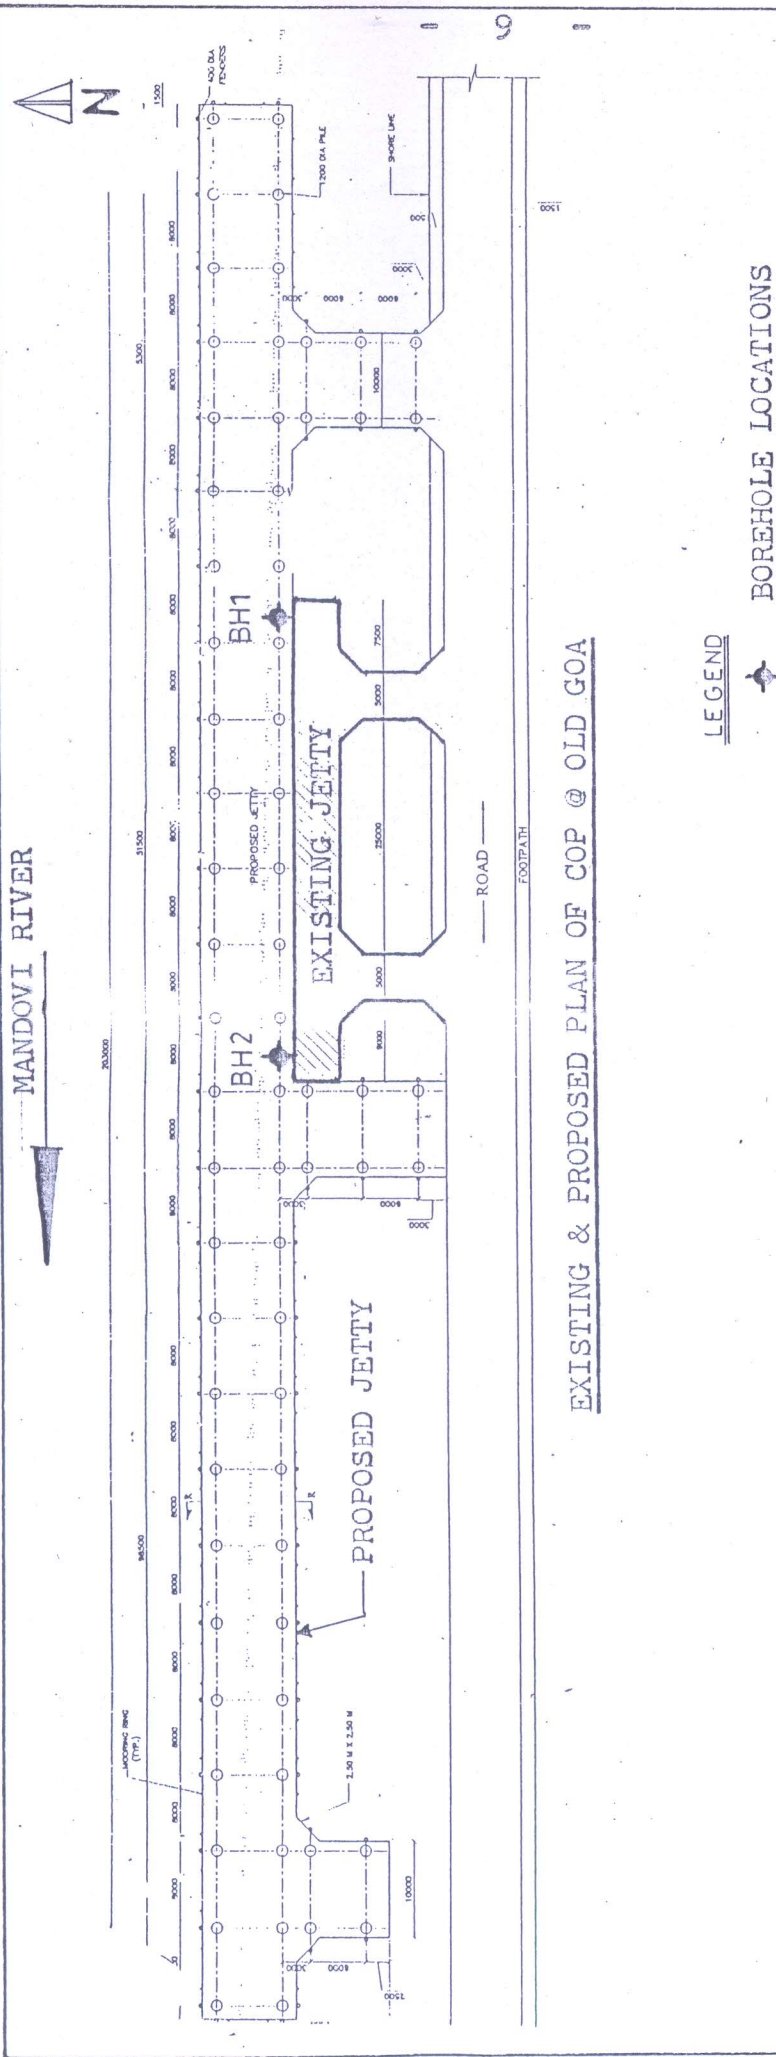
SITE LAYOUT PLAN SHOWING BOREHOLE LOCATIONS (NTS)
